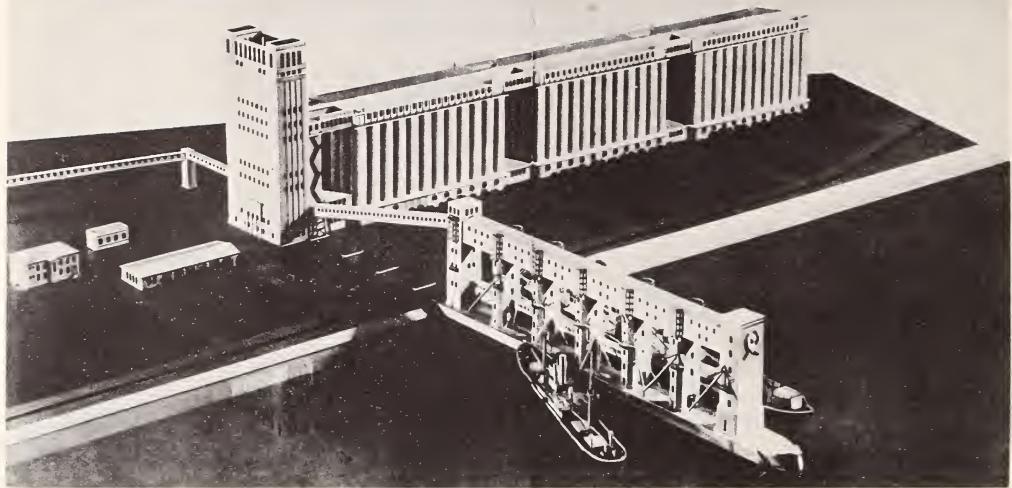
Model (above) and layout of port elevator under construction at Odessa.
